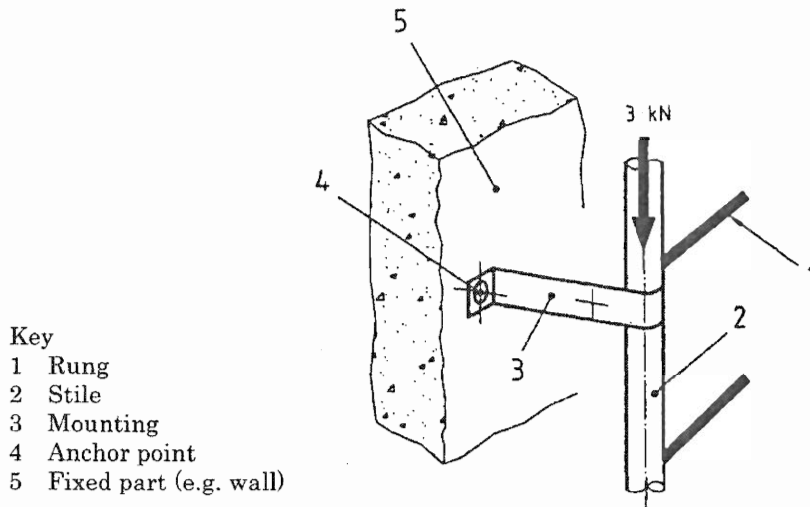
Arrangement for assessment of anchor points and connections of fixed ladders with two stiles
